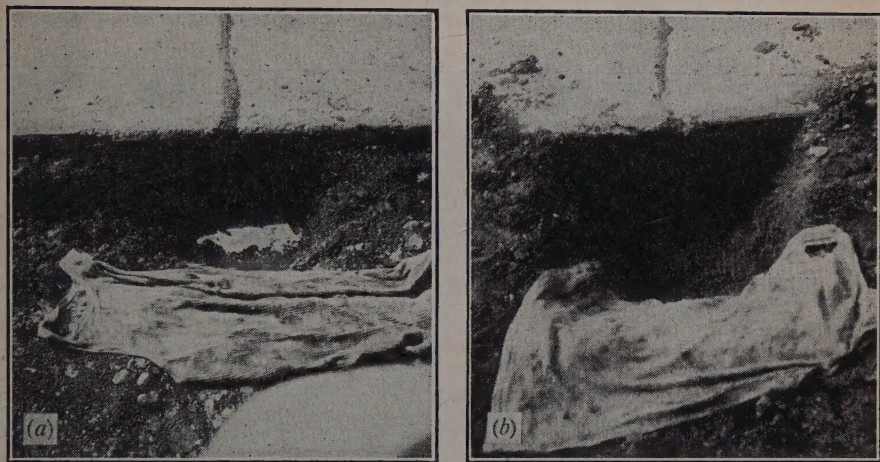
COMPARATIVE TEST SECTIONS AT EDGE OF PAVEMENT
